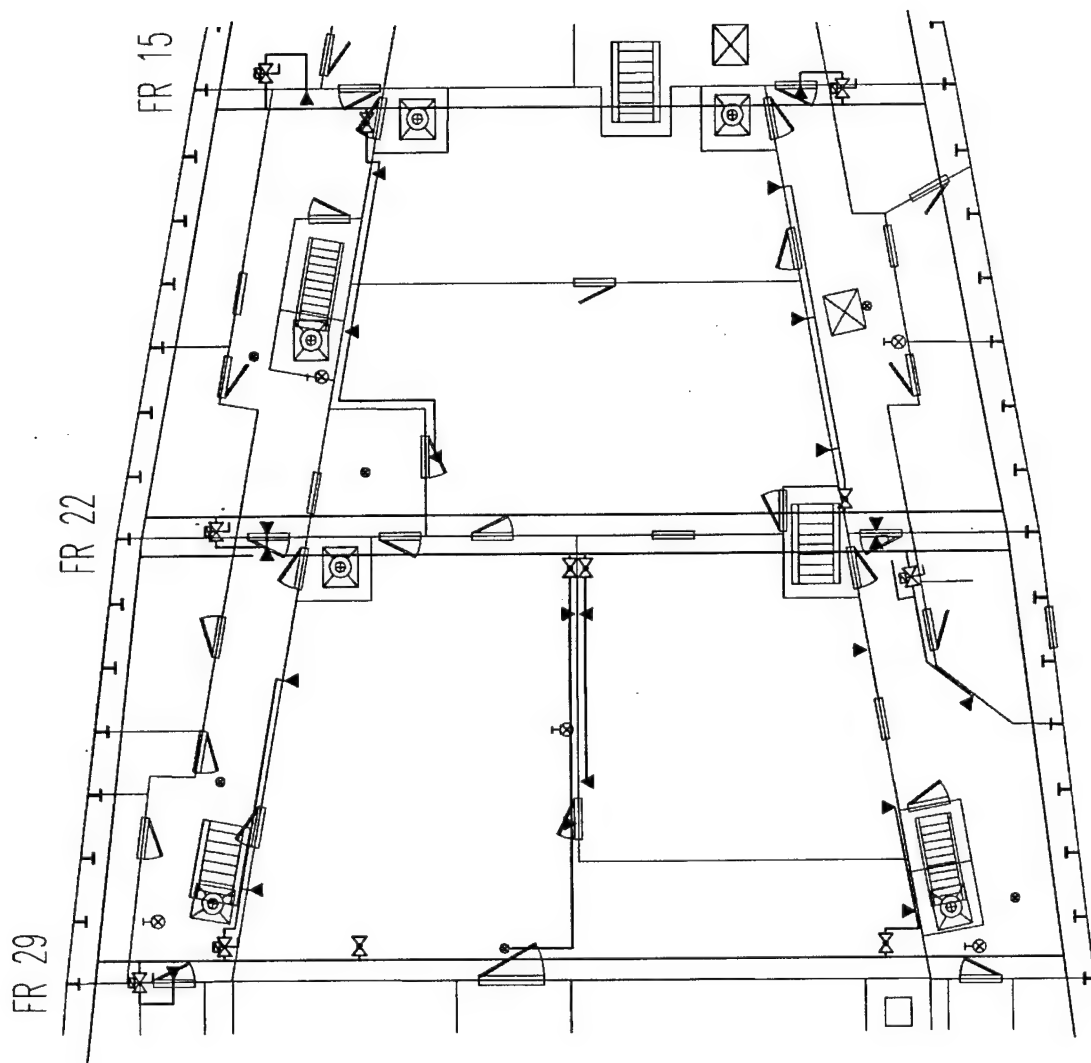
Nozzle layout for flashover suppression, Second Deck
